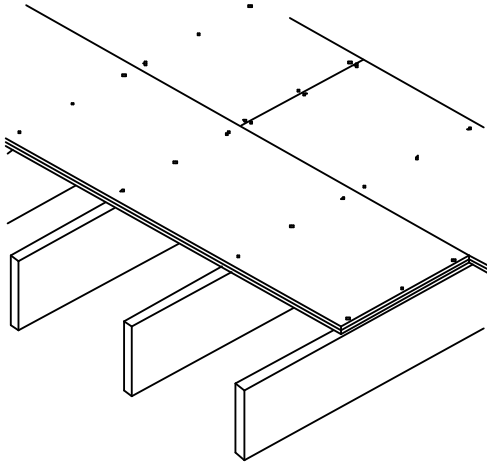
Tongued and grooved edge structural decking should be laid across the joists with short edges supported on joists.
